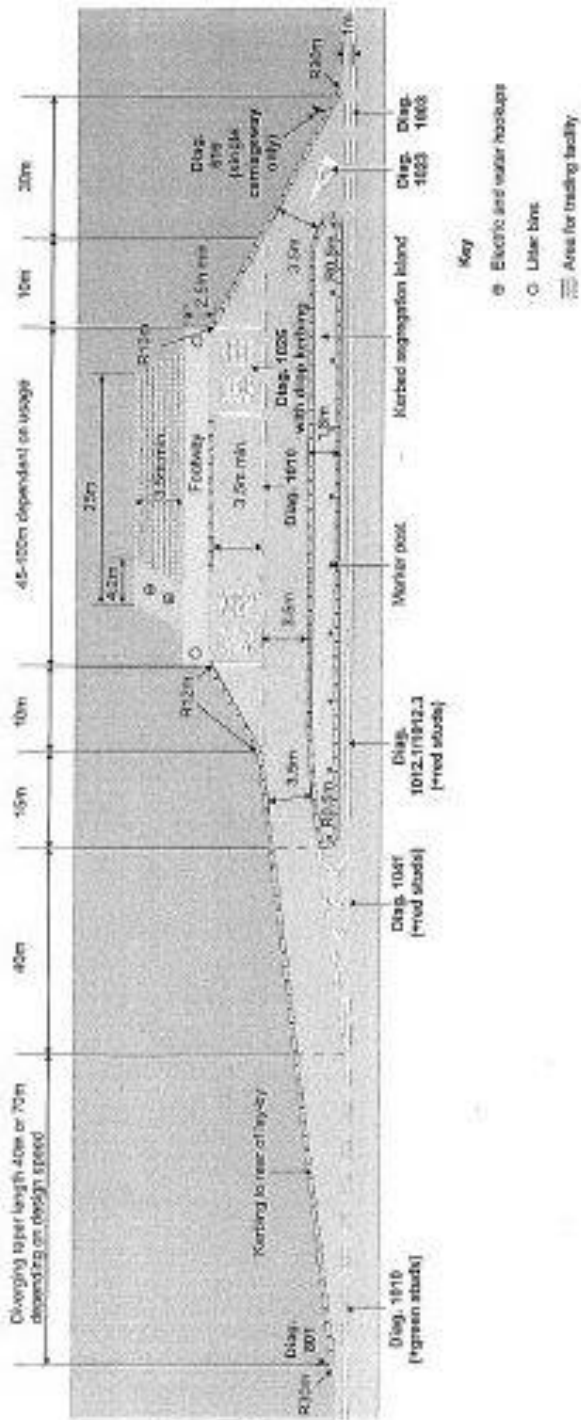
/4: Geometric Layout of Type A lay-by with Trading Facility
